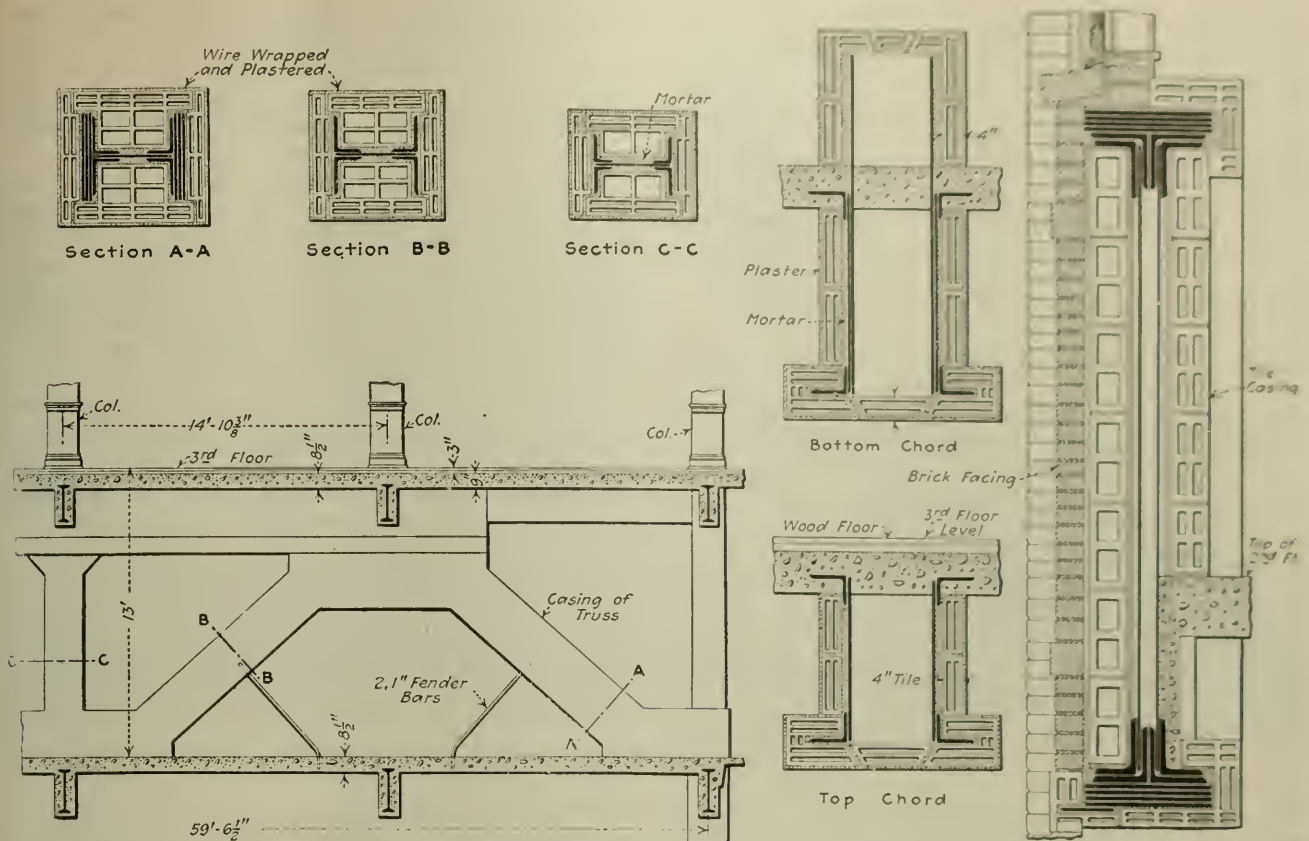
TRUSS AND GIRDER DETAILS AND FIREPROOFING
